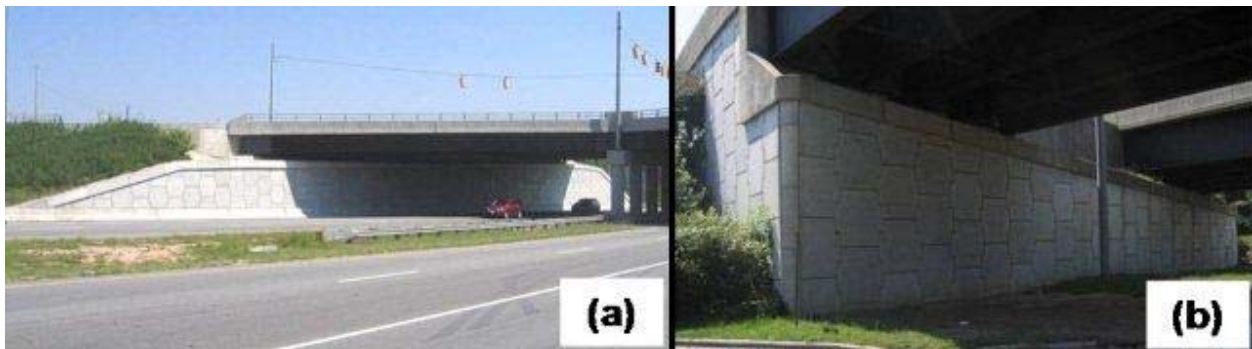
Retaining walls for study: (a) US1/NC98 and (b) US147 Hillandale wall.
